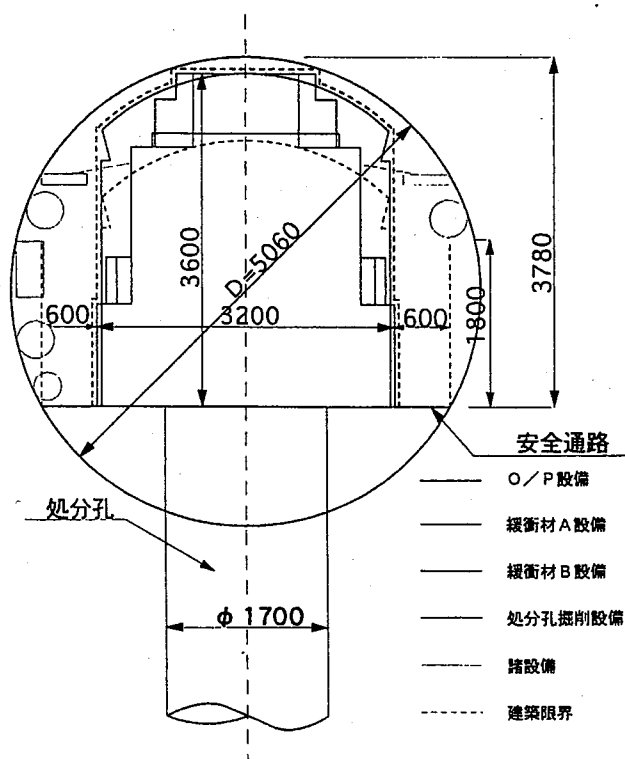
Necessary shape of section for vertical emplacement of waste packages in disposal tunnel (an example of circular-shaped tunnel)
